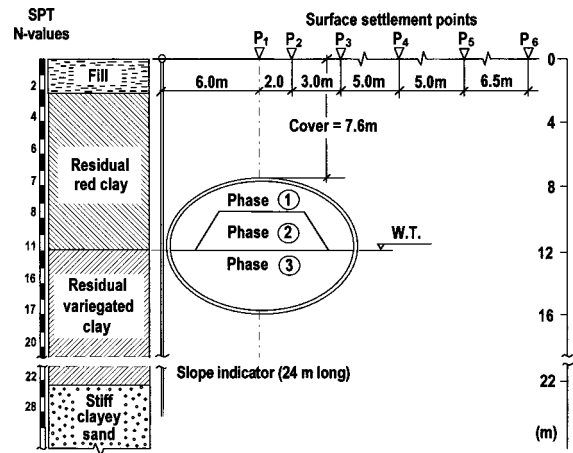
Geotechnical profile, tunnel construction phases, and instrumentation
